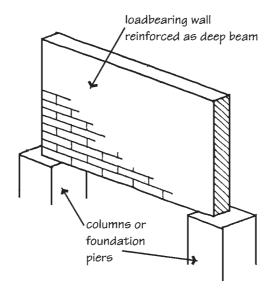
Deep wall beams. (From Schneider and Dickey, Reinforced Masonry Design, 2nd ed., Prentice-Hall, 1987.)
